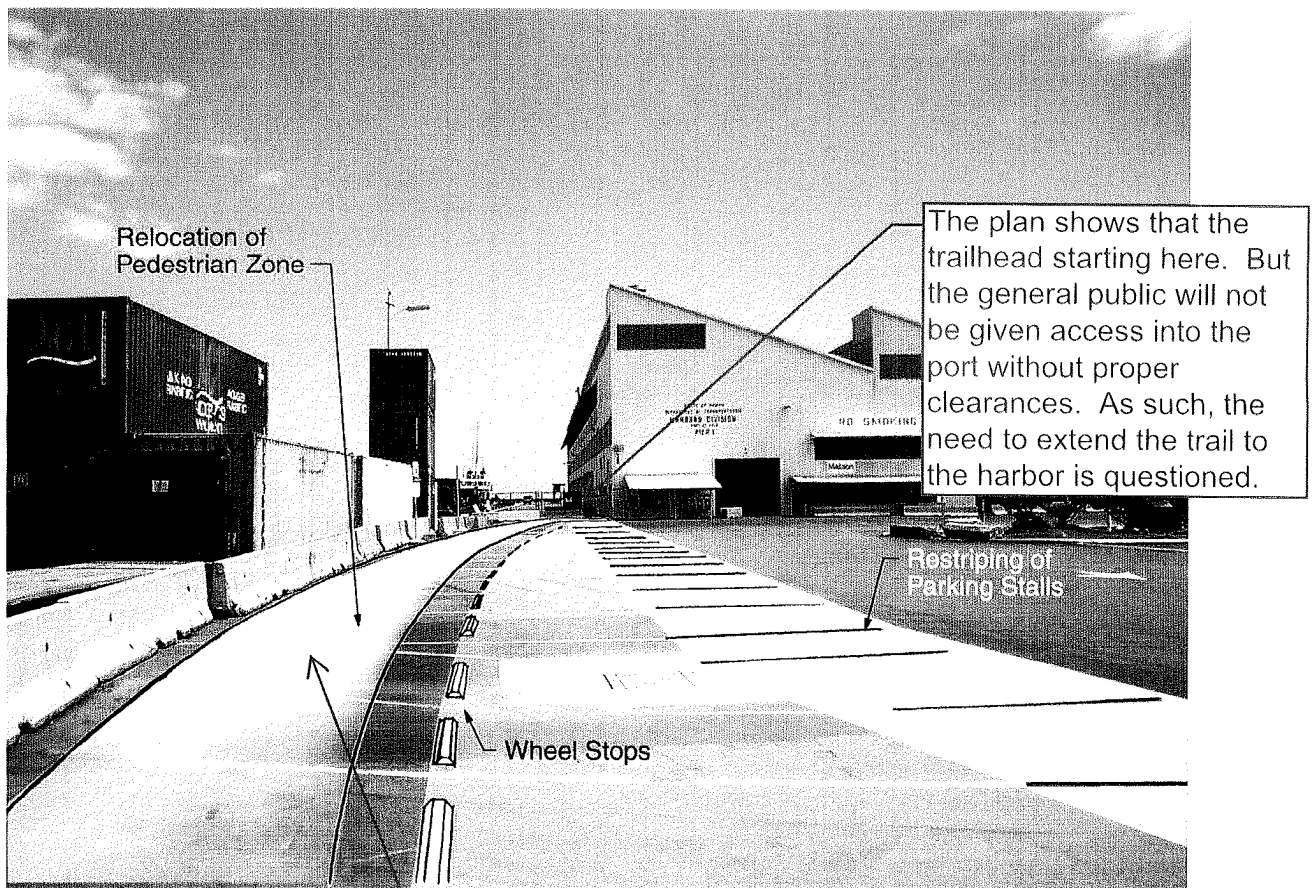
Short-term pedestrian alignment plan at Kūhiō Street.
